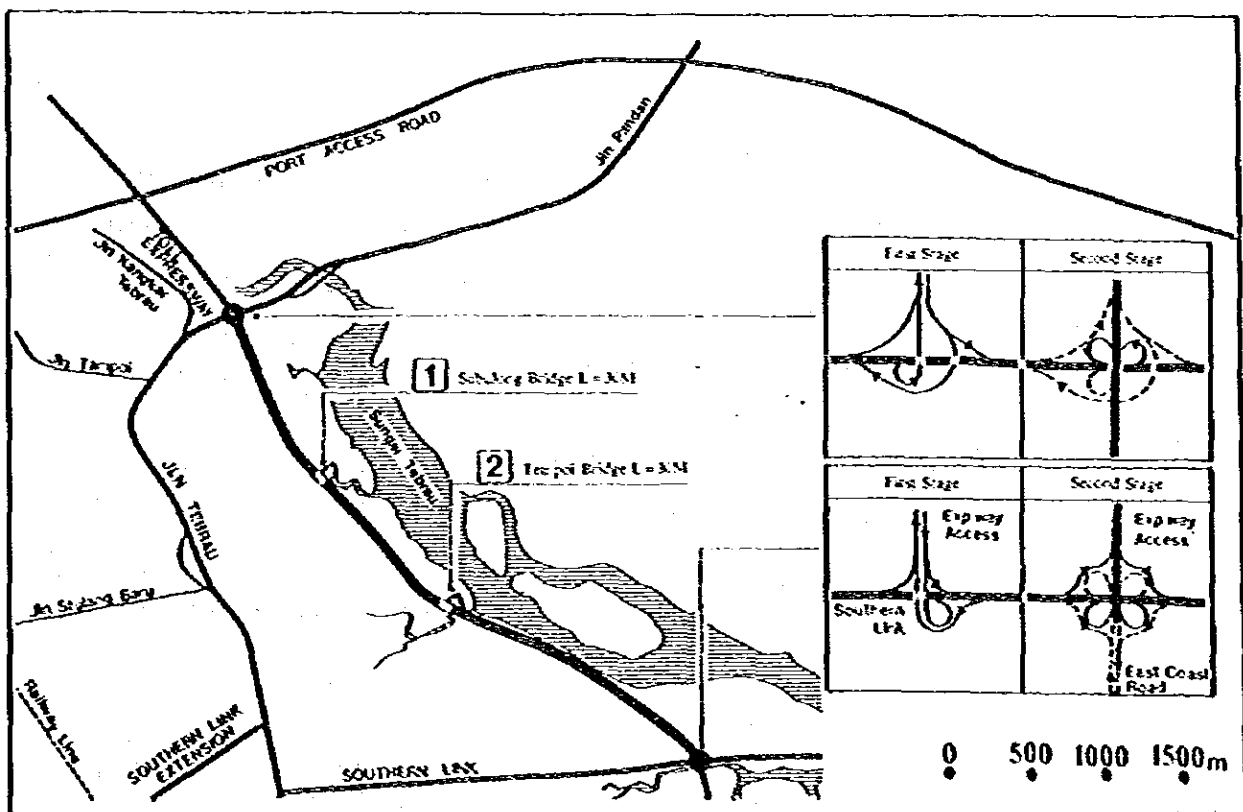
TOLL EXPRESSWAY ACCESS: BRIDGE LOCATION
